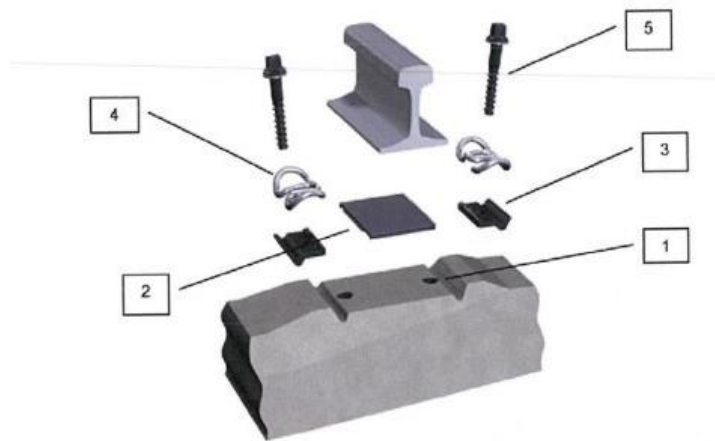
The details of concrete sleeper with the Vossloh fastening assembly. [1]
